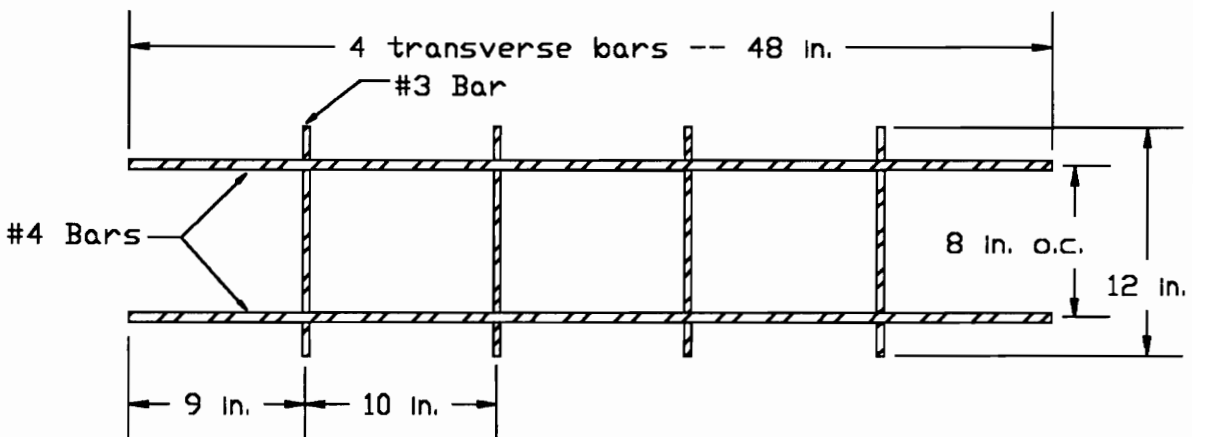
Bar Layout for FRP Bar Reinforced Beams
